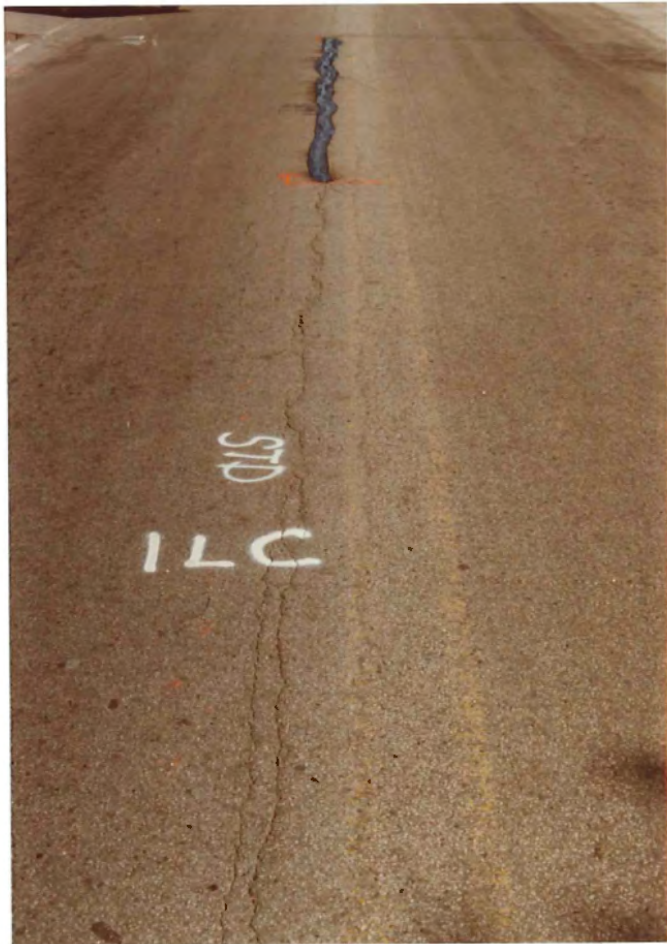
Example of longitudinal crack prior to treatment with standard crack filler.
